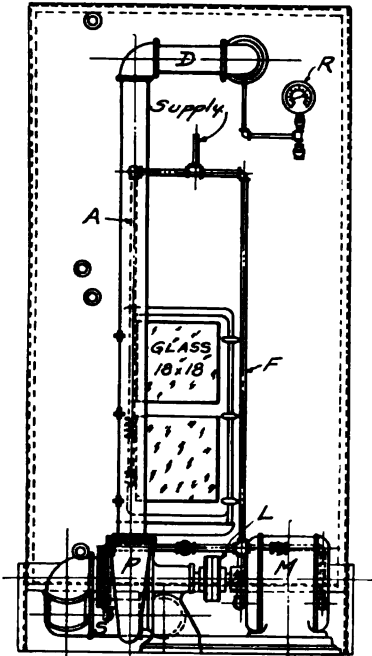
OUTSIDE VIEW OF AIR WASHER, SHOWING PUMP AND MOTOR.
